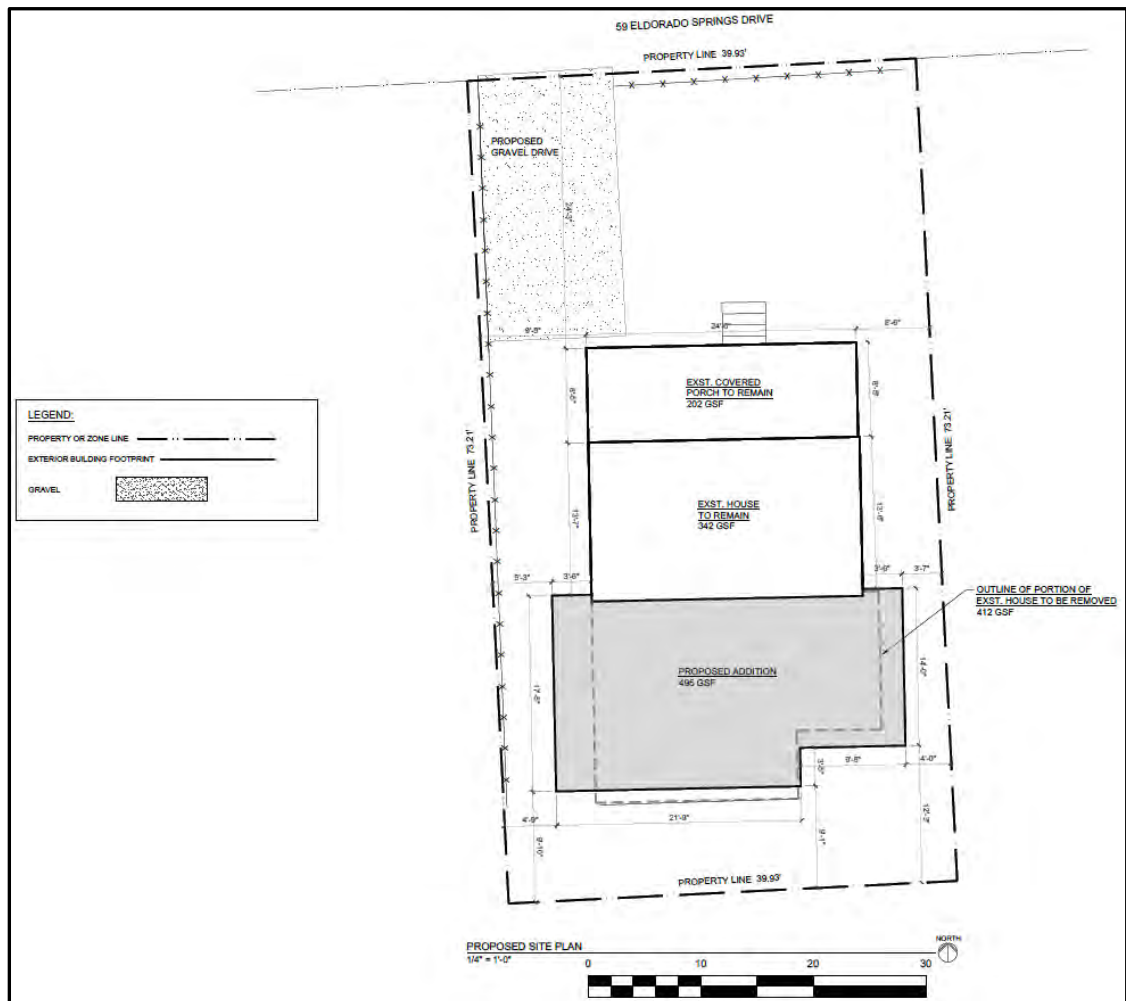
Submitted site plan showing existing and proposed improvements, as well as setback encroachments on all required yards (available in better detail on Page XX of Attachment A)
